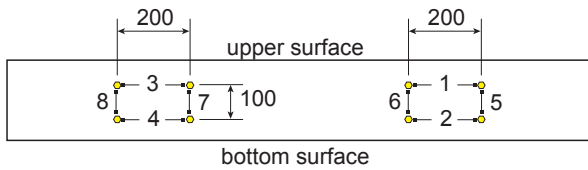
Plug arrangement for expansion measurement (unit: mm)
